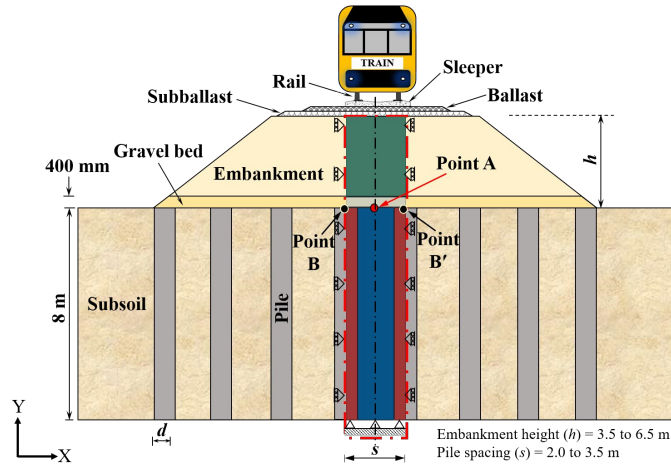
A typical pile-supported railway embankment with modelled unit cell (modified from Meena et al. [9])
